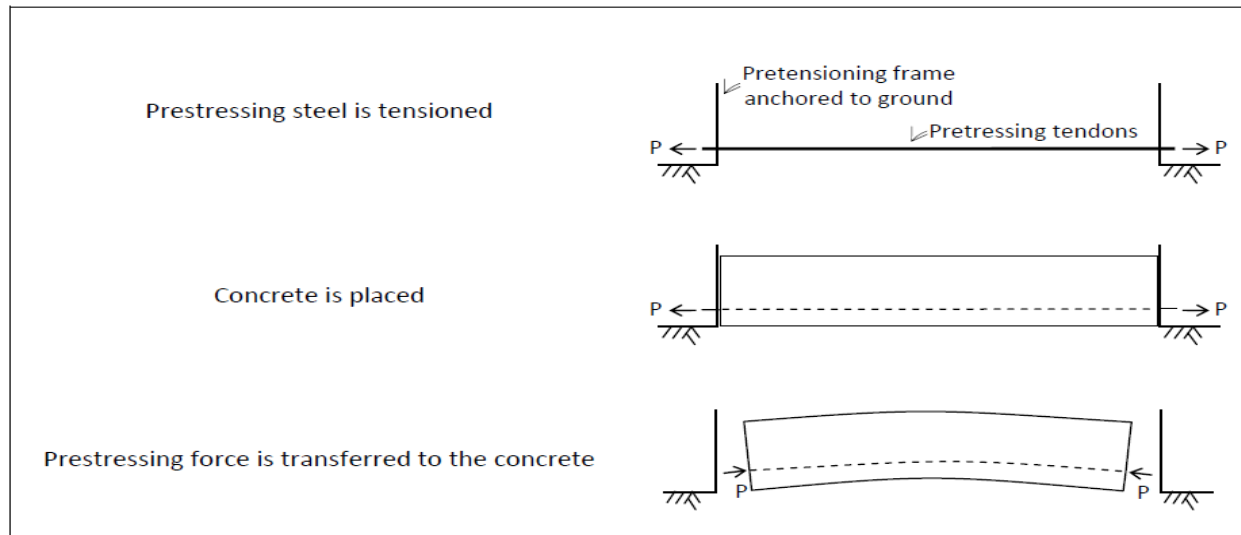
Construction sequence for pre-tensioned concrete beam
